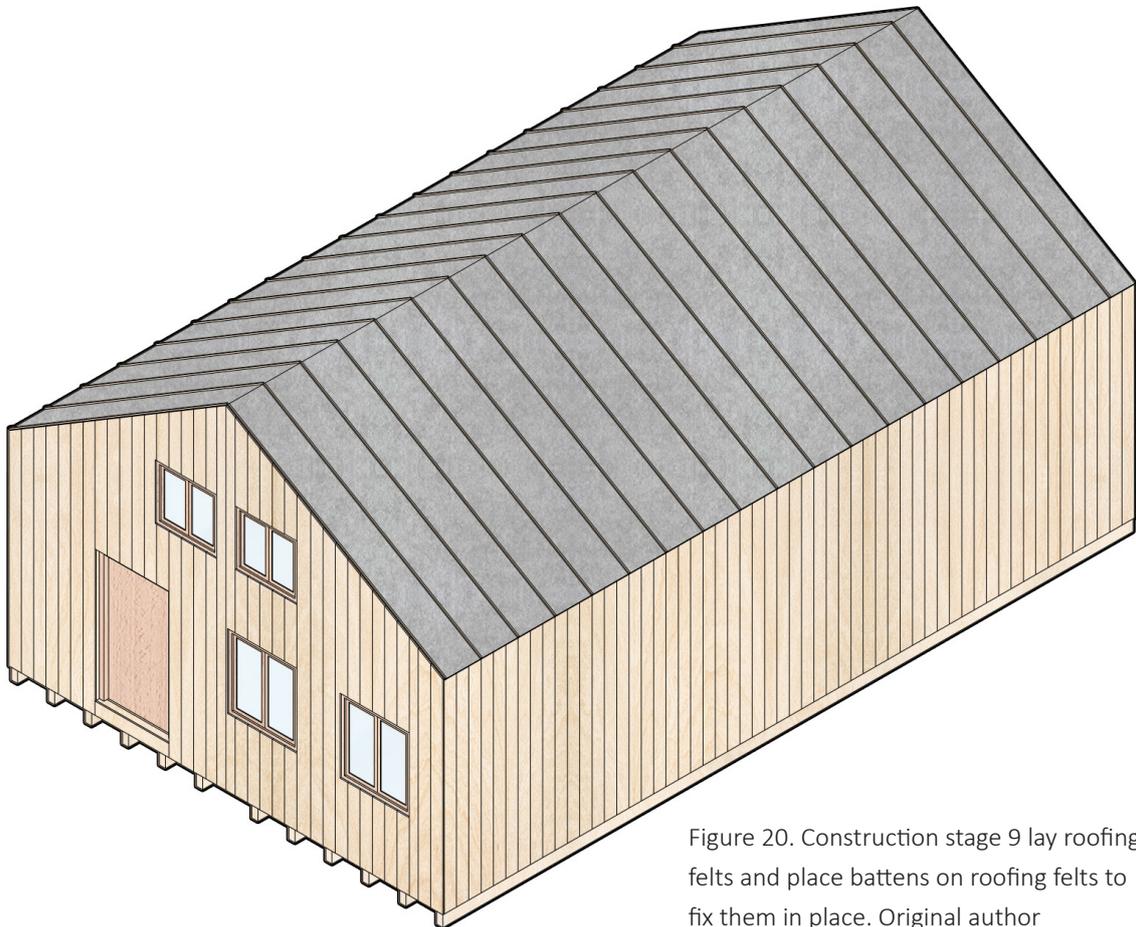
Construction stage 9 lay roofing felts and place battens on roofing felts to fix them in place. Original author
